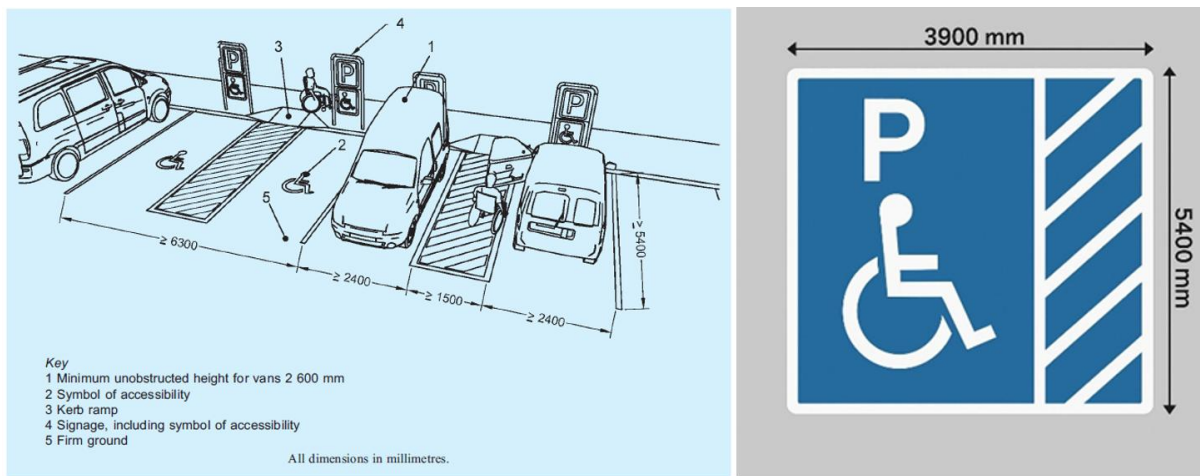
Accessible Parking spaces with one Shared Transfer Area (Source: NBC, 2016)
